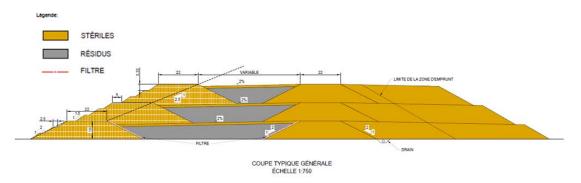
General Cross Section of the Tailings and Waste Rocks Facility
